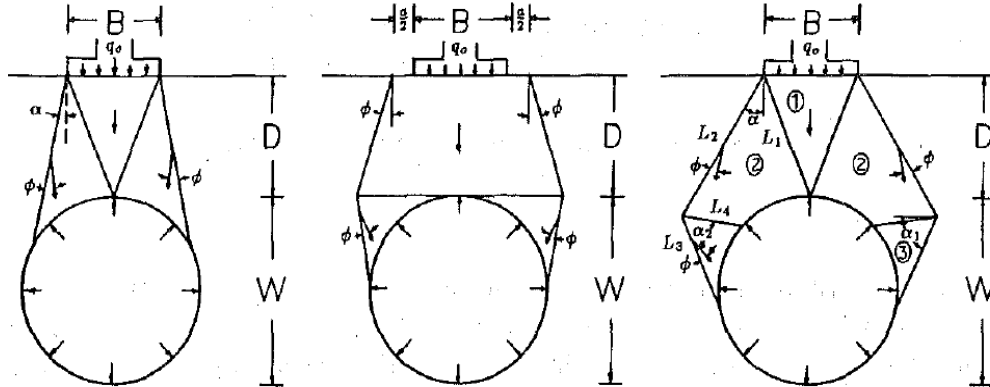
Failure Mechanisms for Footing Collapse [5]
